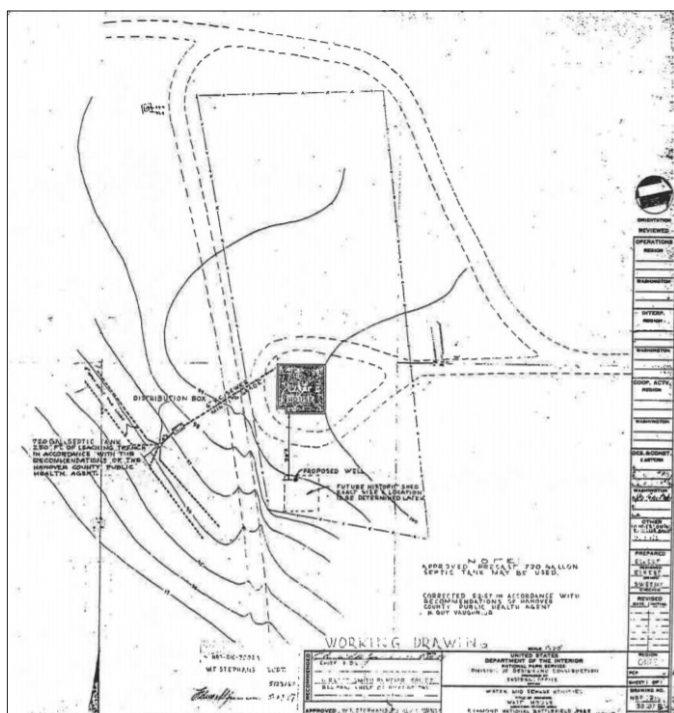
(Top) Working drawing showing plans for the water and septic system at the Watt house, 1957. Drawing shows layout of existing roads and fences (RICH Archives, RICH_367_3002B).
